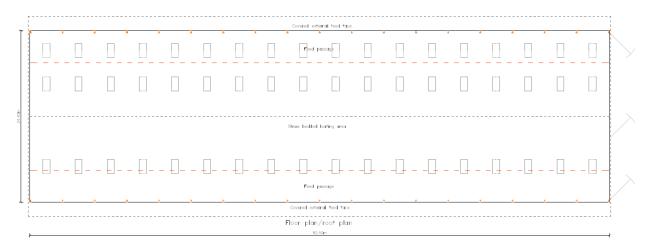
Building B – Proposed Floor Plan / Roof Plan
